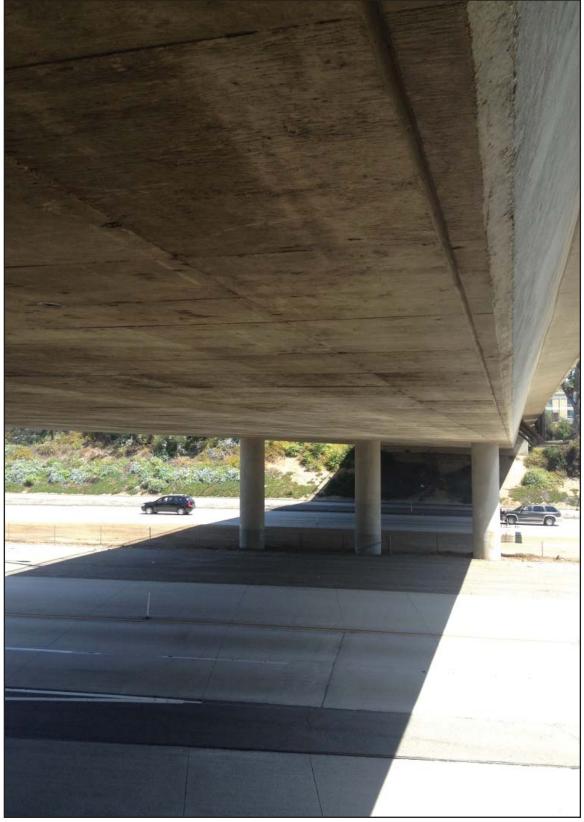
Green Street OC Bridge, facing east: (August 29, 2013)
